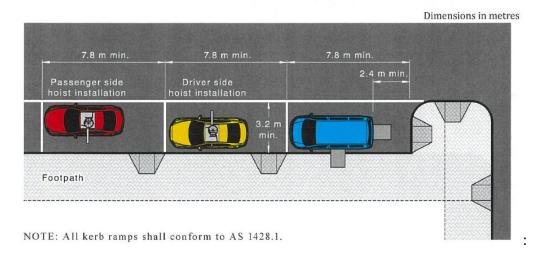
Examples of accessible parallel parking without kerb extensions
